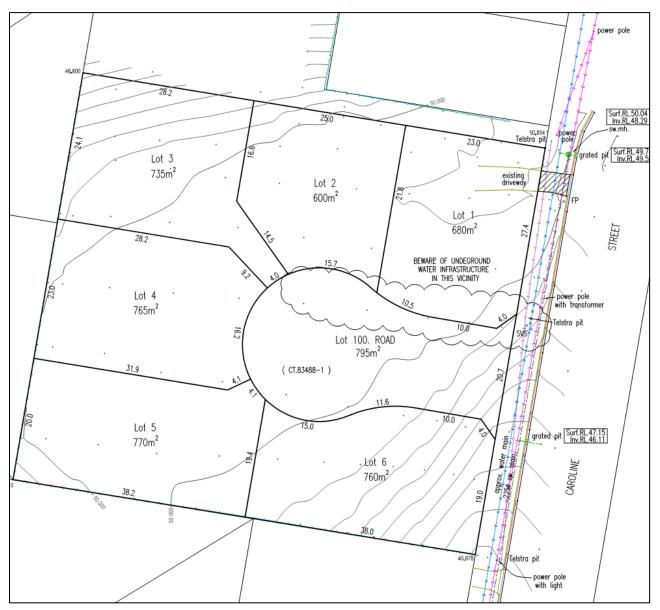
Proposed Subdivision Plan (Michell Hodgetts Pty Ltd, 2017)
